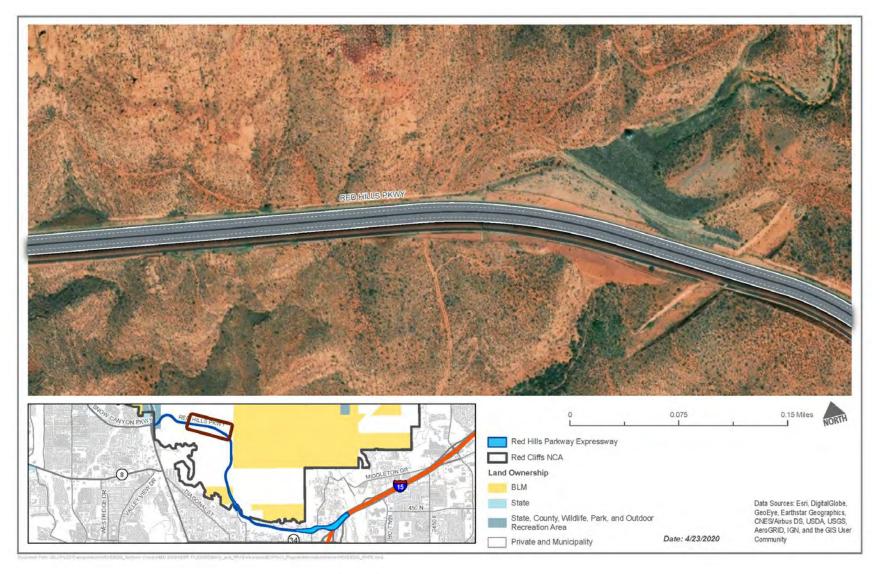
Red Hills Parkway Expressway Plan View (2 of 7)
